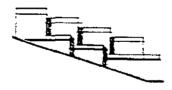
Architectural Concepts Design Criteria (2)(b)(i) of this section. Building Orientation.
